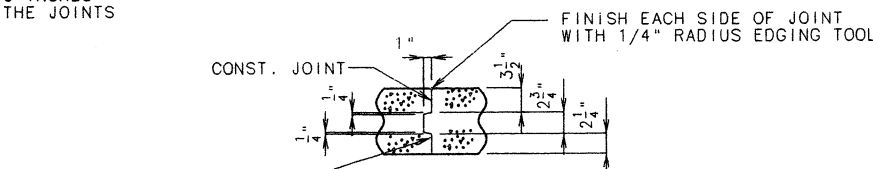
DETAIL OF CONST. JT. FOR SLAB ON P/S PANEL
